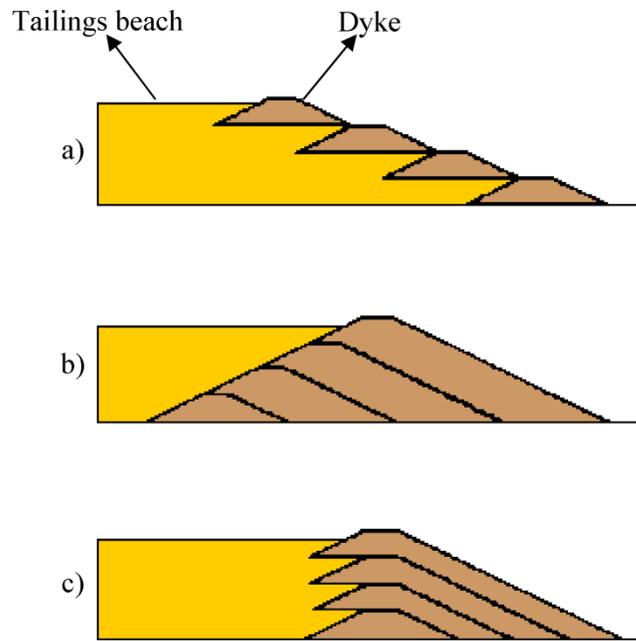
a) Upstream construction, b) downstream construction, and c) centerline construction (after Vick, 1983)
